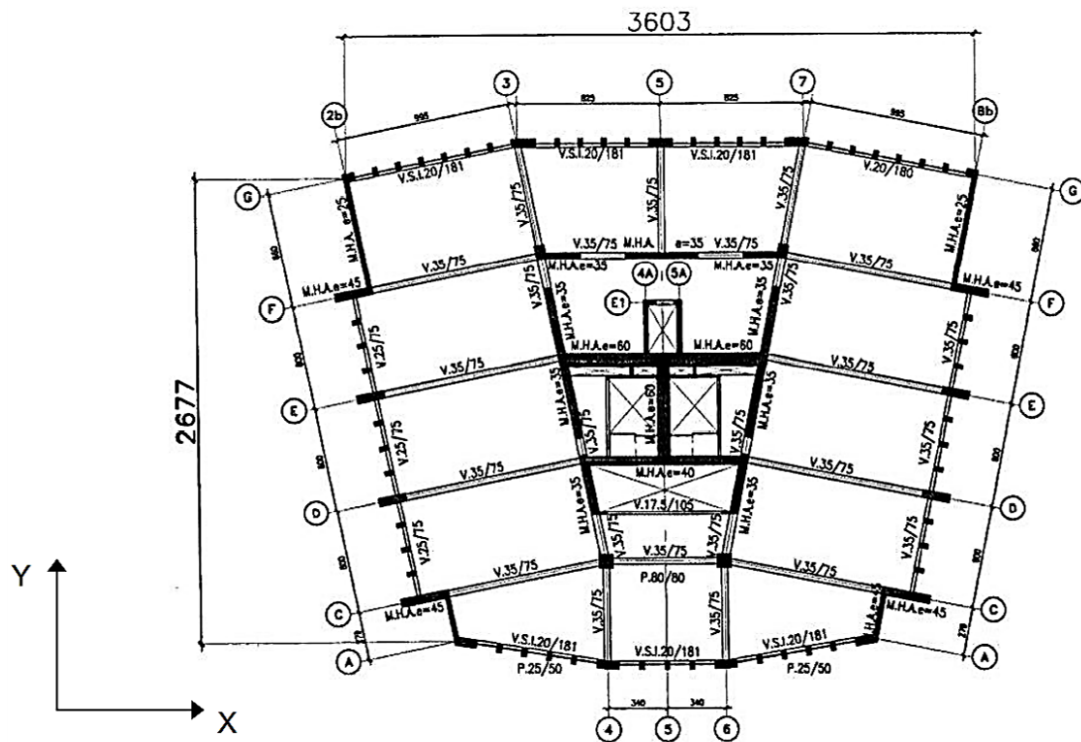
9<sup>th</sup>-12<sup>th</sup> floors structural details. CChC Building [5].
